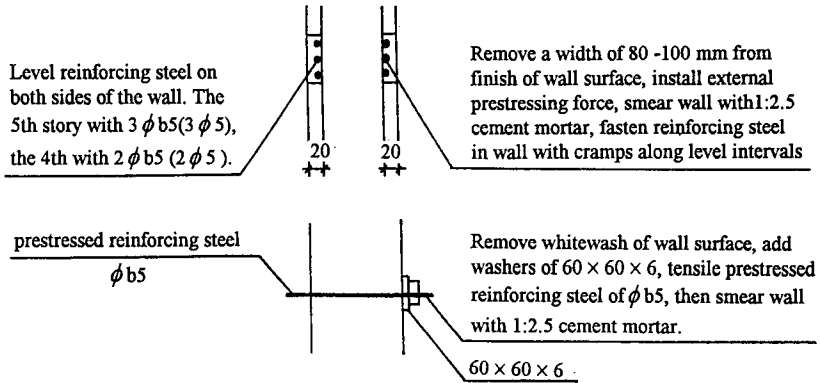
Prestressing force draw bar anchoring on the wall surface
